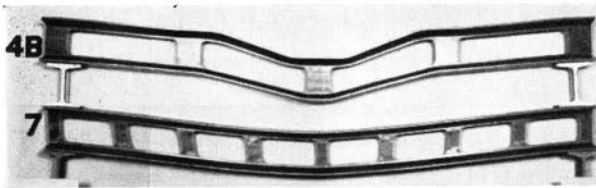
Center Loading Failures in 3-in. I-Beams, Rectangular Cutouts
